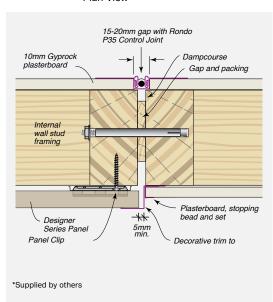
Typical Junction with Masonry Wall – Plan View
